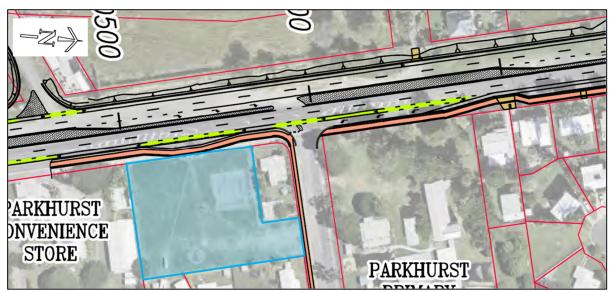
Yaamba Road (Bruce Highway) / Mason Avenue Intersection Concept Plan [Source: TMR RNAU Concept]
